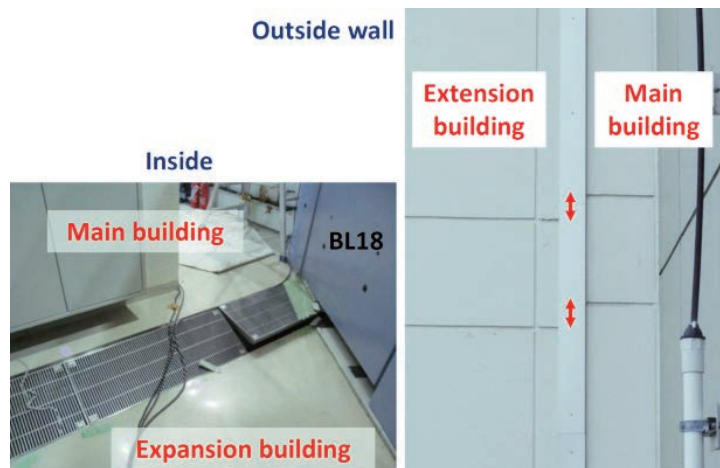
Inside floor and outside wall around MLF main and west-side extension buildings.
